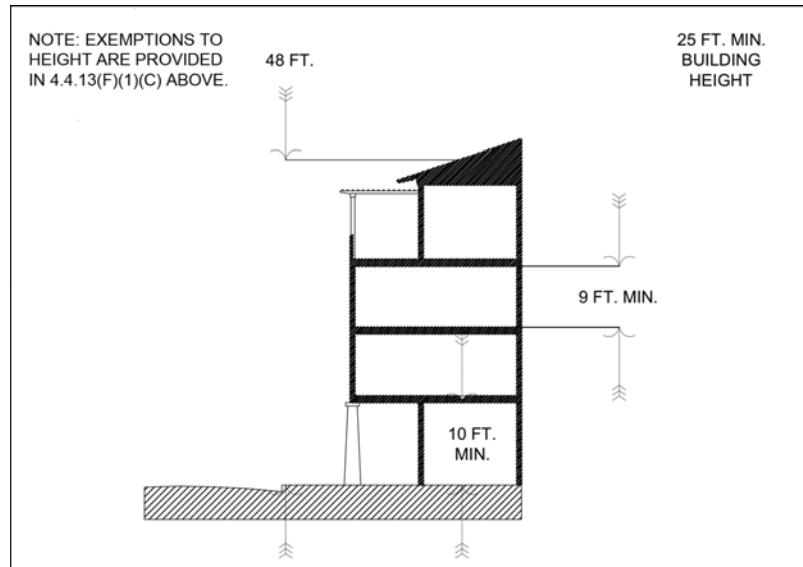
Building Height Requirements [Amd. Ord. 6-07 3/5/07]
